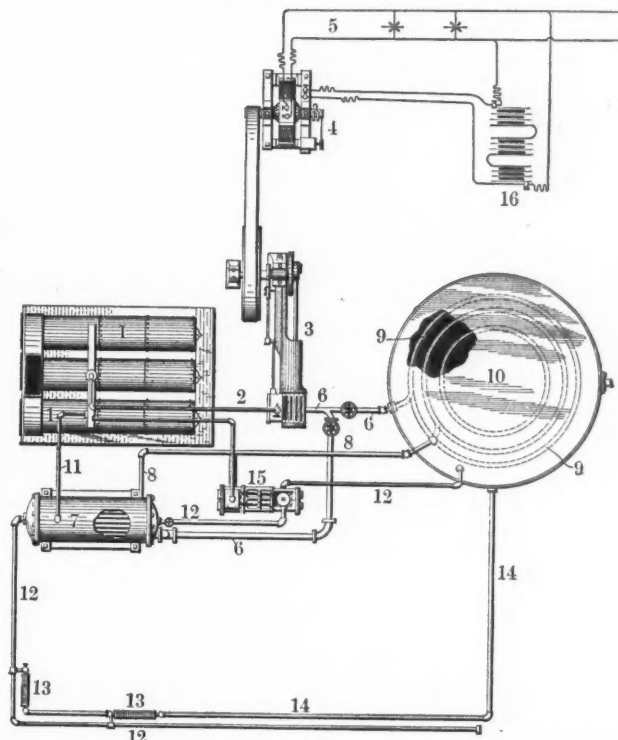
1. Boilers. 3. Engine. 4. Dynamo. 6. Exhaust Steam Pipes. 7. Heater. 9. Heating Coll. 10. Hot Water Storage. 15. Circulating Pump 16. Storage Battery.
